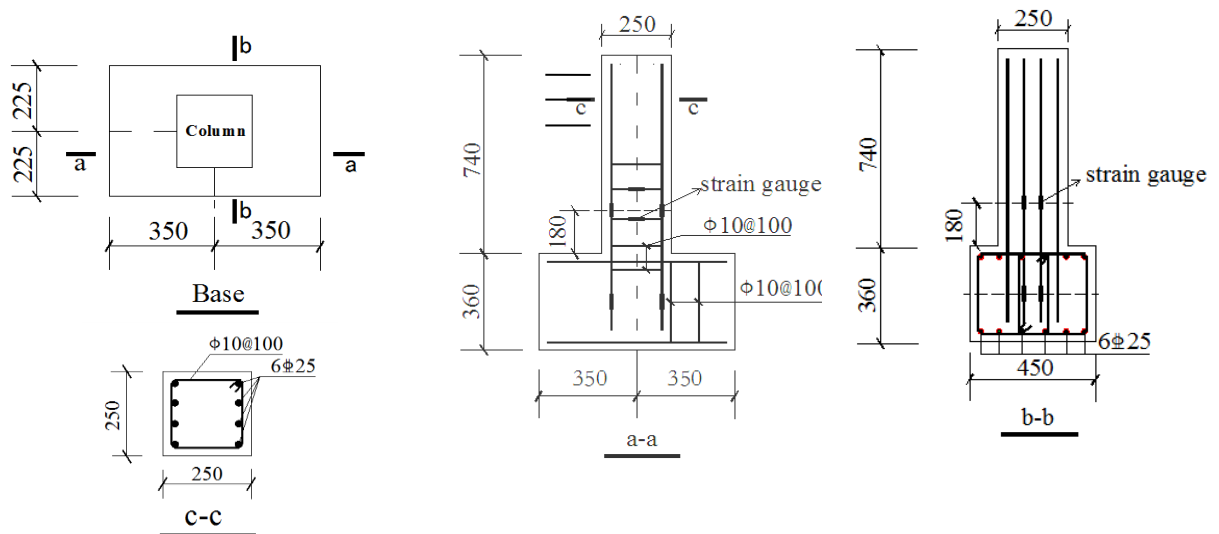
Geometry and reinforcement information of specimens (unit: mm)
